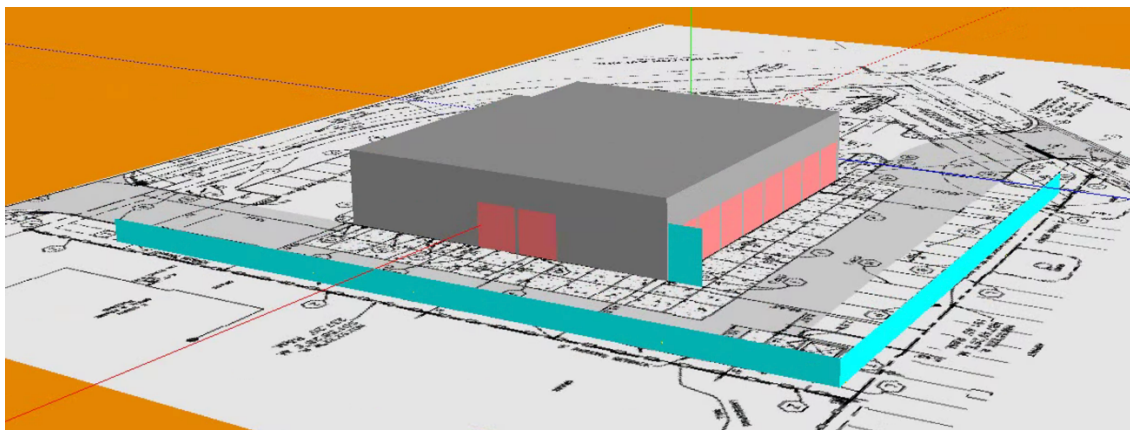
SoundPlan 3D View – External Wall and Property Line Fence/Wall
